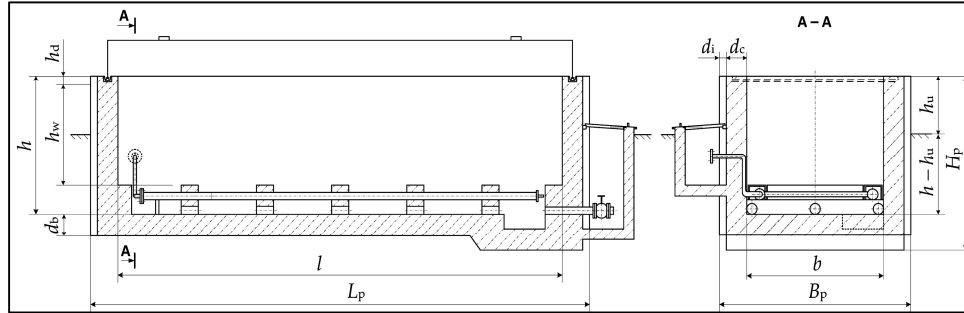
Longitudinal and transverse sections of the concrete pit used in the study
